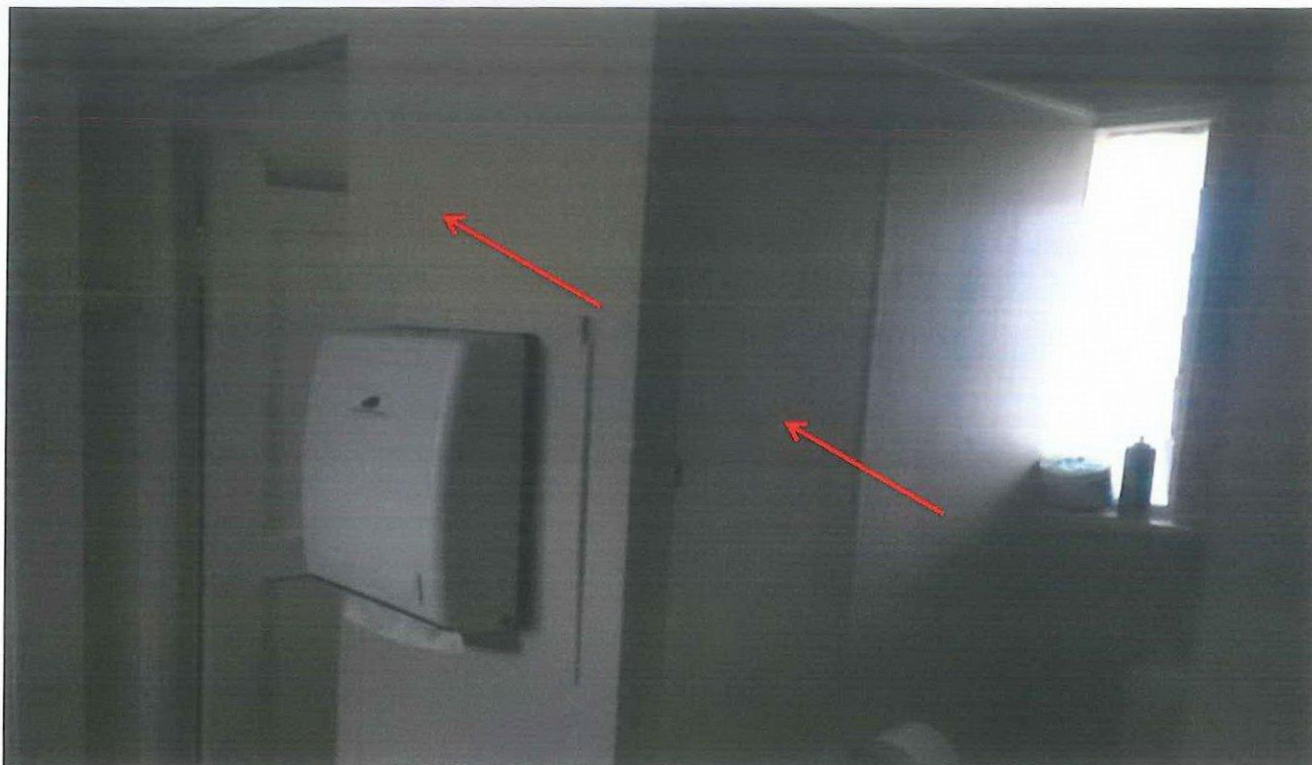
Asset D00040 – Former Lawson Golf Course – Clubhouse – Male Change Rooms – toilet area – asbestos cement sheet toilet partition wall cladding and cover panels.
